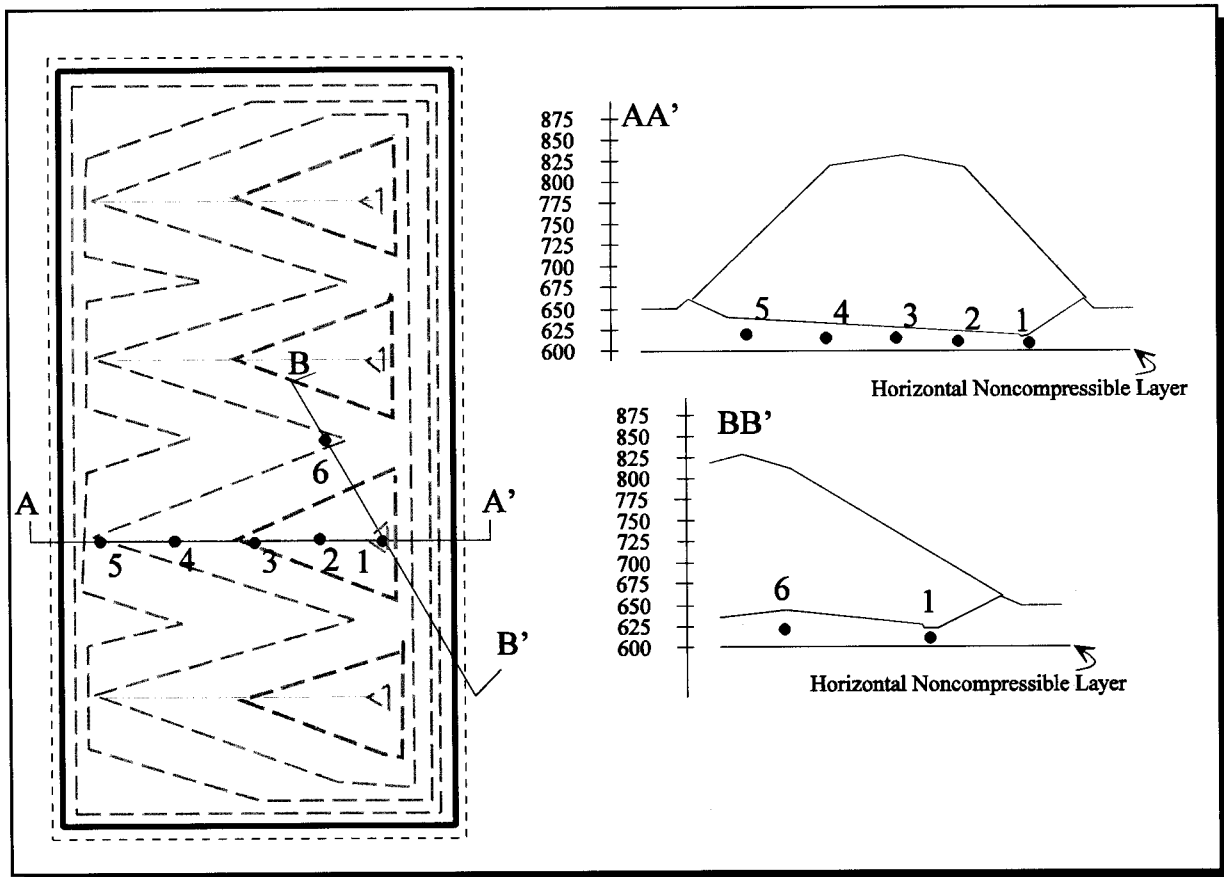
Example plan view and cross sections showing some of the locations selected for settlement analysis.
